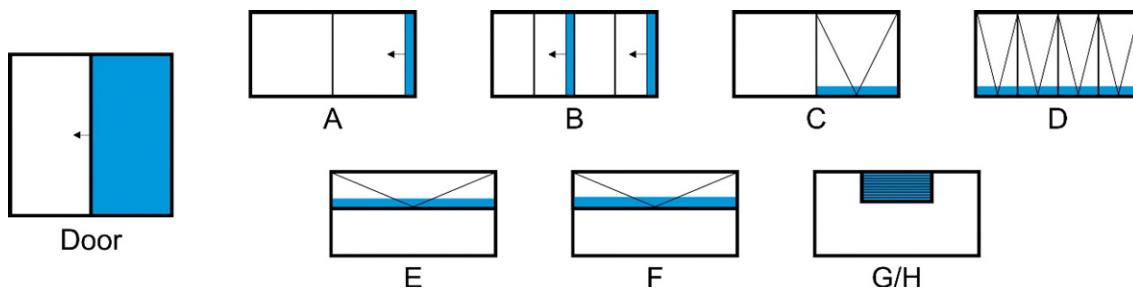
Typical Balcony Door Frame Size of 2.4m×2.4m Frame Size (Door) and Typical 2nd Opening Types for a 2.4m×1.2m Overall Frame Size (A-H)
